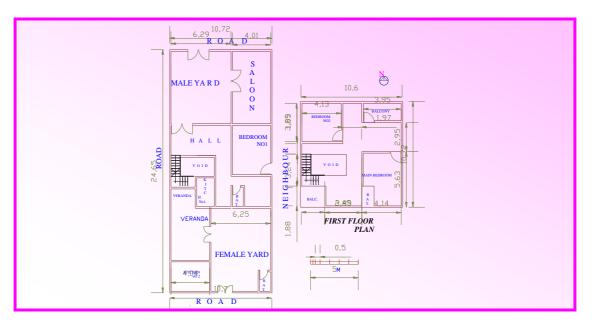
Ali Hammada house floors plan (Source: Author)
